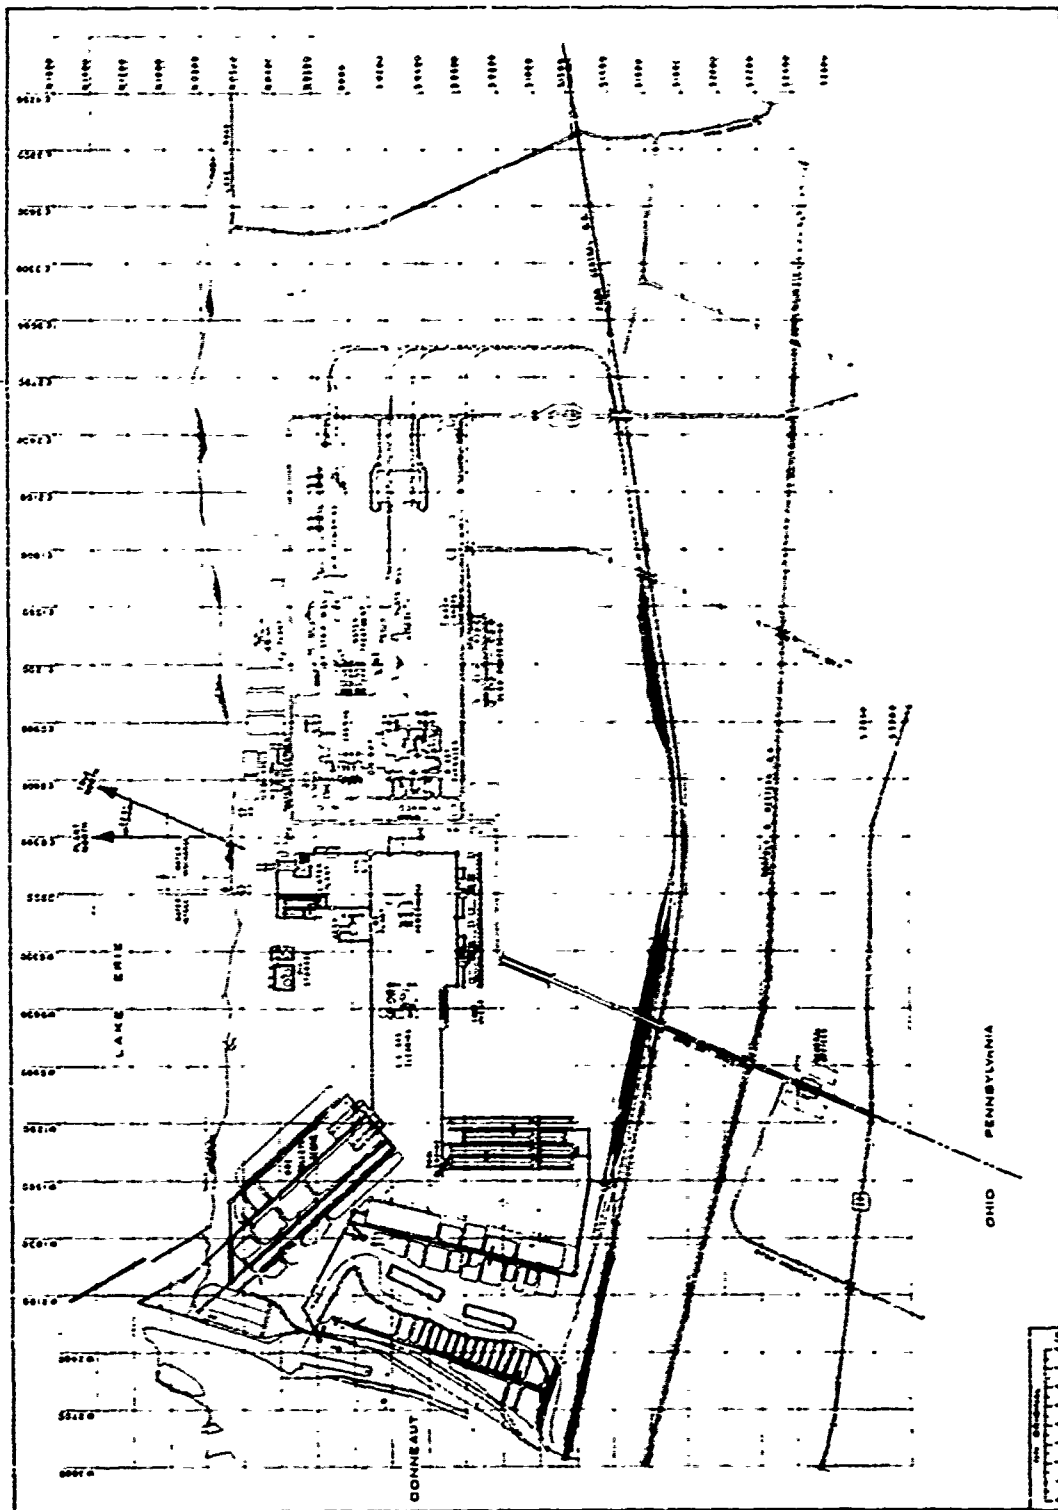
ALTERNATE PLANT LAYOUT-A
